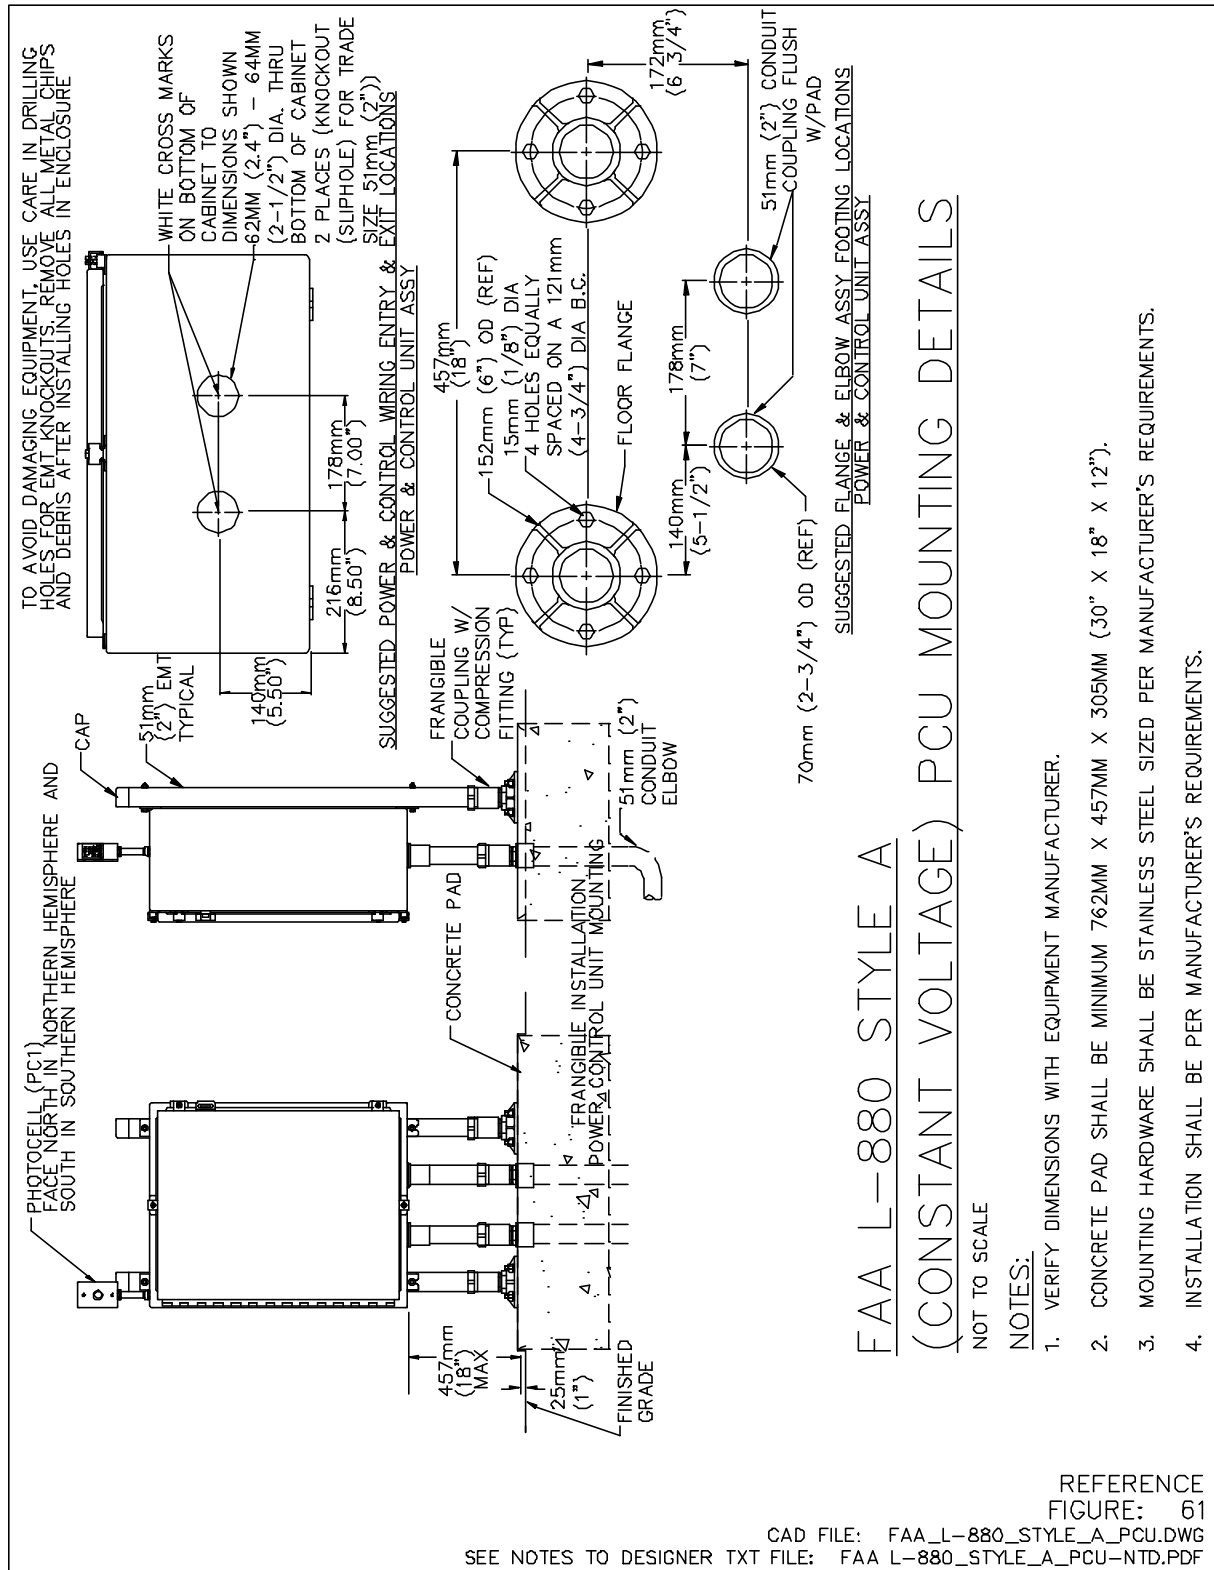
FAA L-880 style A (Constant Voltage) PCU Mounting Details
